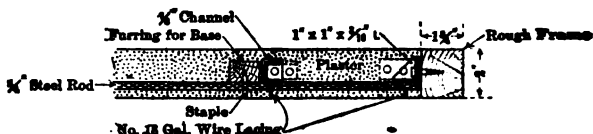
Two-inch Solid Plaster Partition. Horizontal Section
